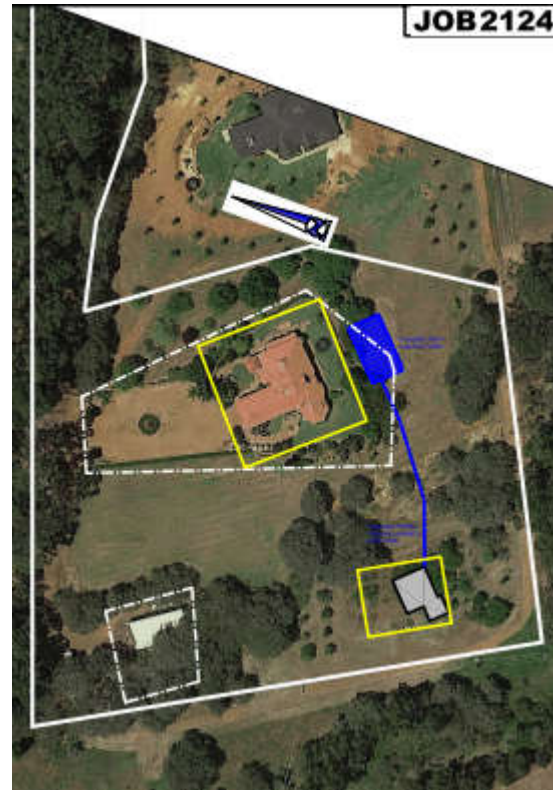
Existing Building envelopes (white dashed line) 3,587m², and 678m². Proposed building envelopes (yellow solid line) 1,500m² and 500m².
